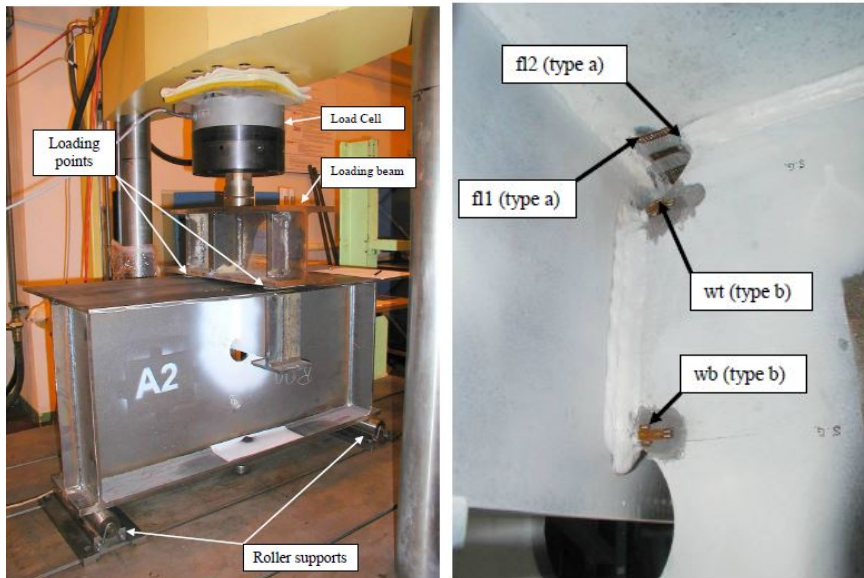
The test specimen mounted on the fatigue test machine and associated hot-spot locations [9]
